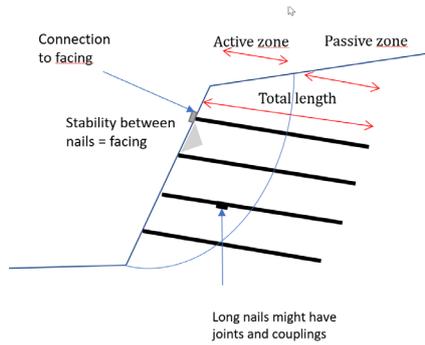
Example of a wall/cutting reinforced with soil nails.
